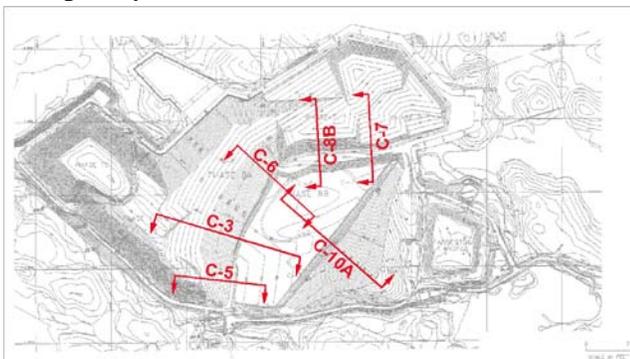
Locations of critical stability sections used to establish and evaluate waste excavation/relocation configurations that would be allowed during construction
